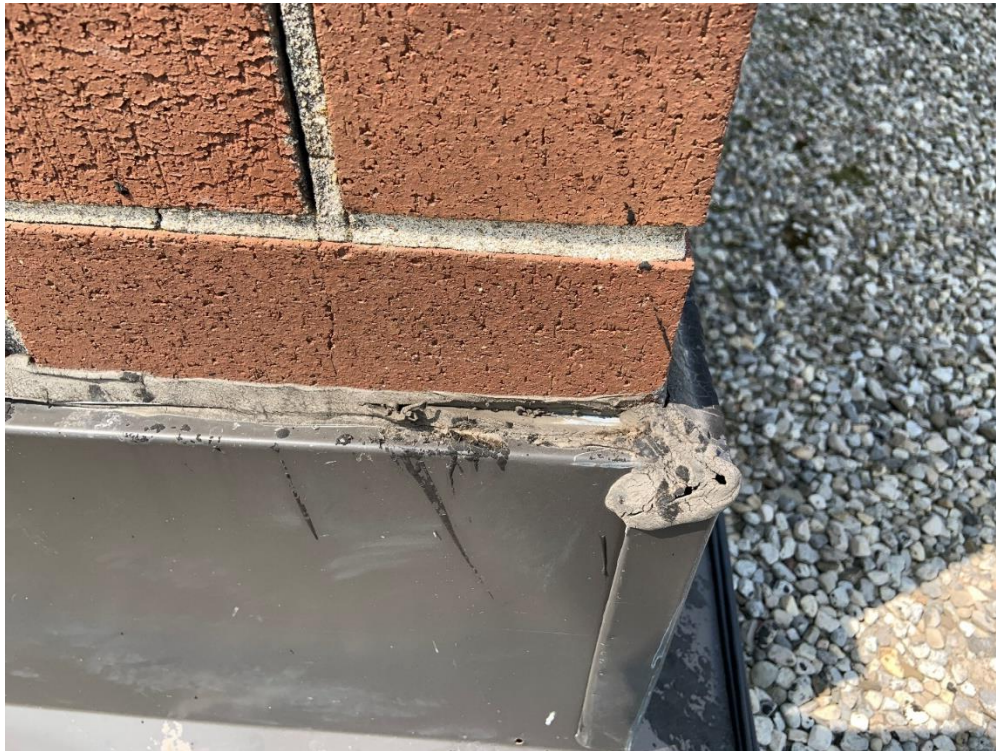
View of the of the roof surface of the south warehouse areas.
